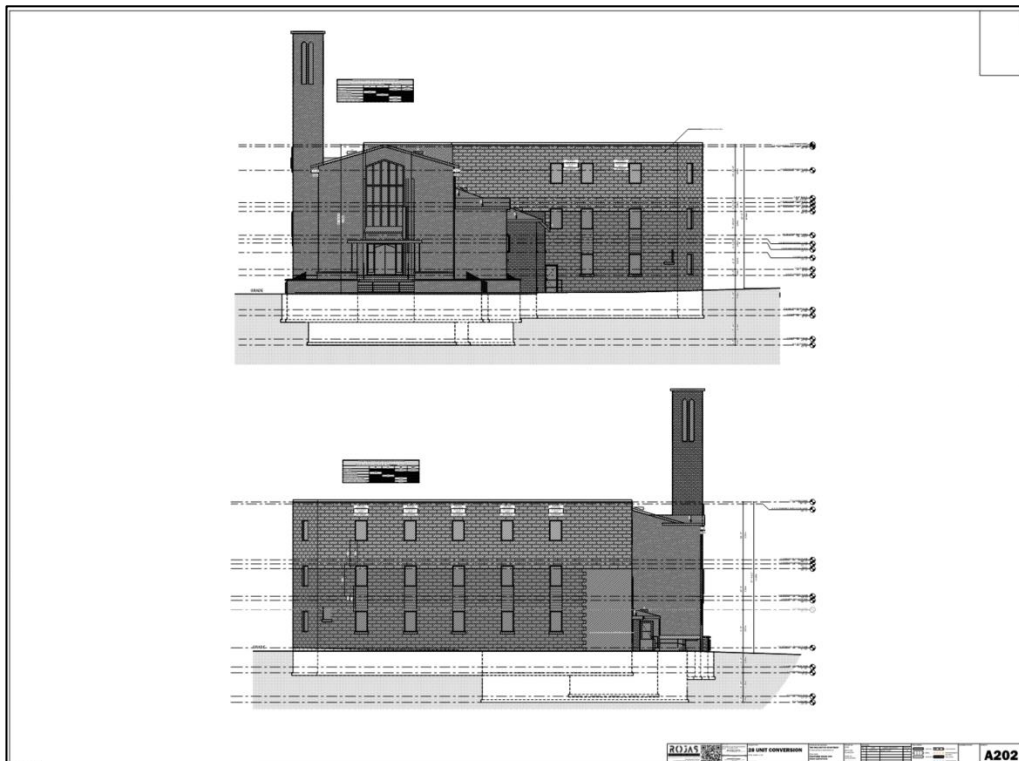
Side elevations of 81 George Street & 97 Wellington Street.
